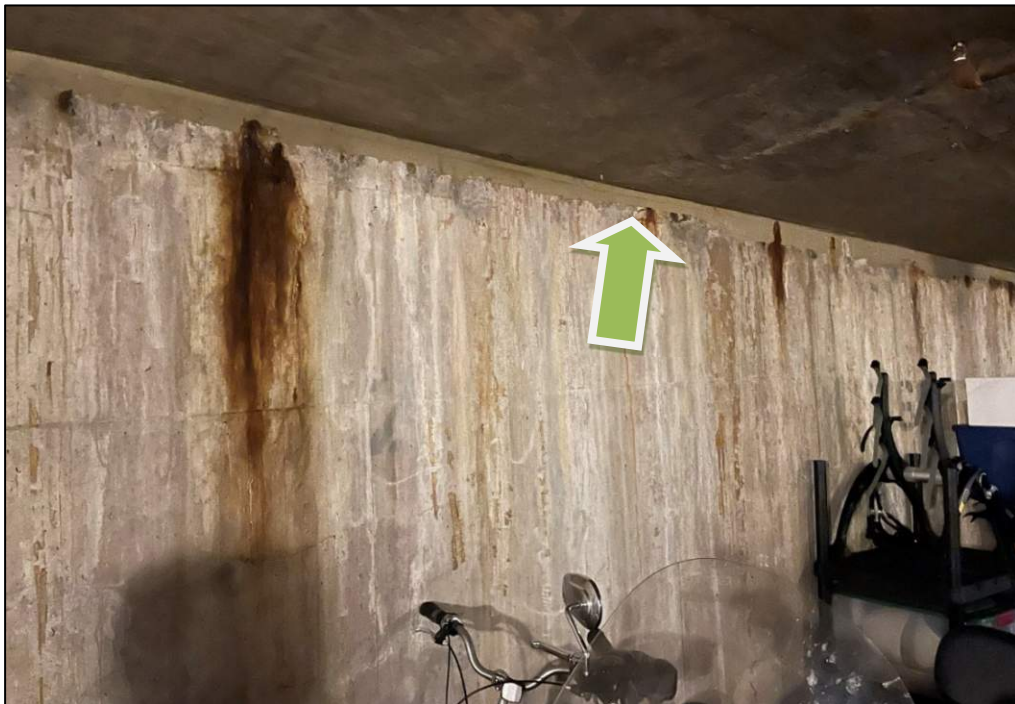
Small leaks have formed within the waterproofing joint at the top of wall.
